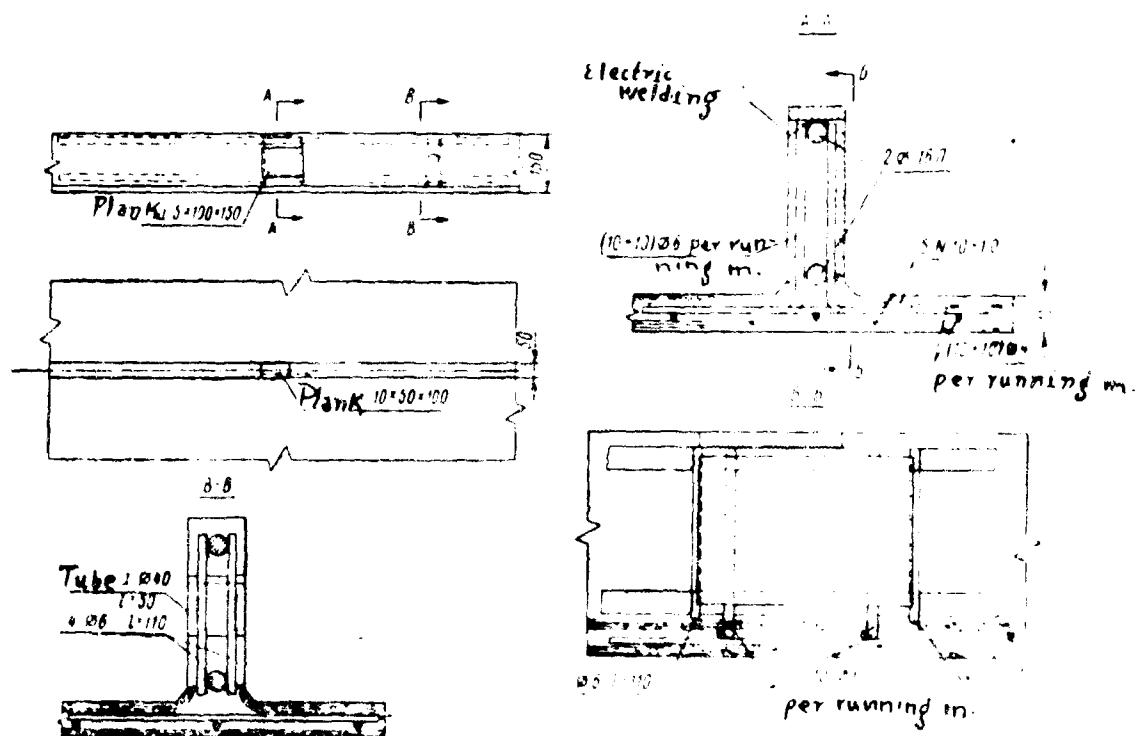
Fastening the Inserted Parts to the Framing Beams.
